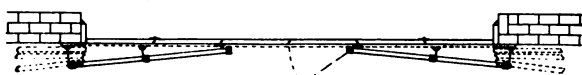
FLOOR PLAN, SIX DOOR OUTFIT
